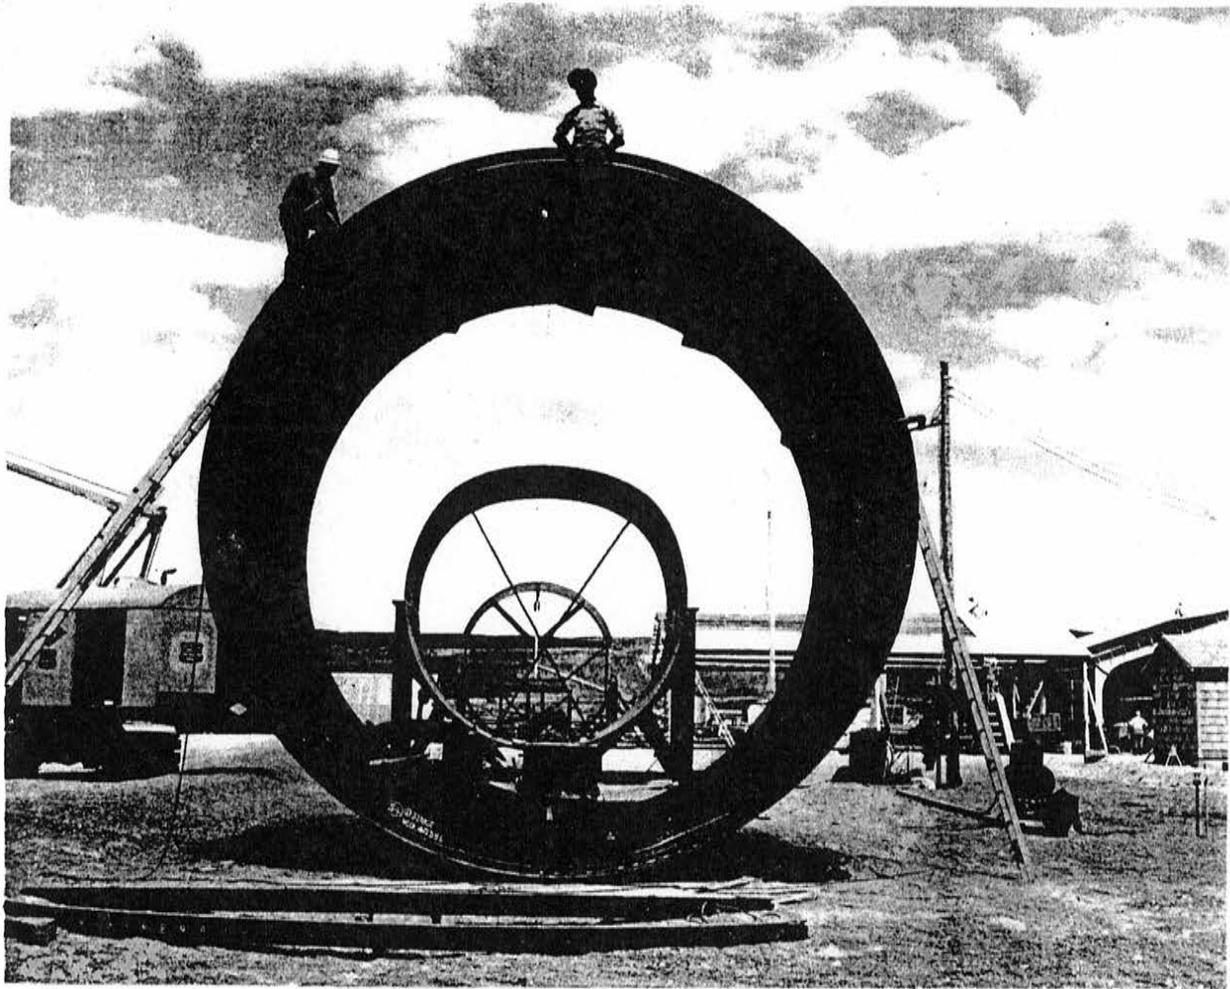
Fabrication of the 1/4" steel-liner plate requires the use of internal structural-steel forms to support the plates during welding.
